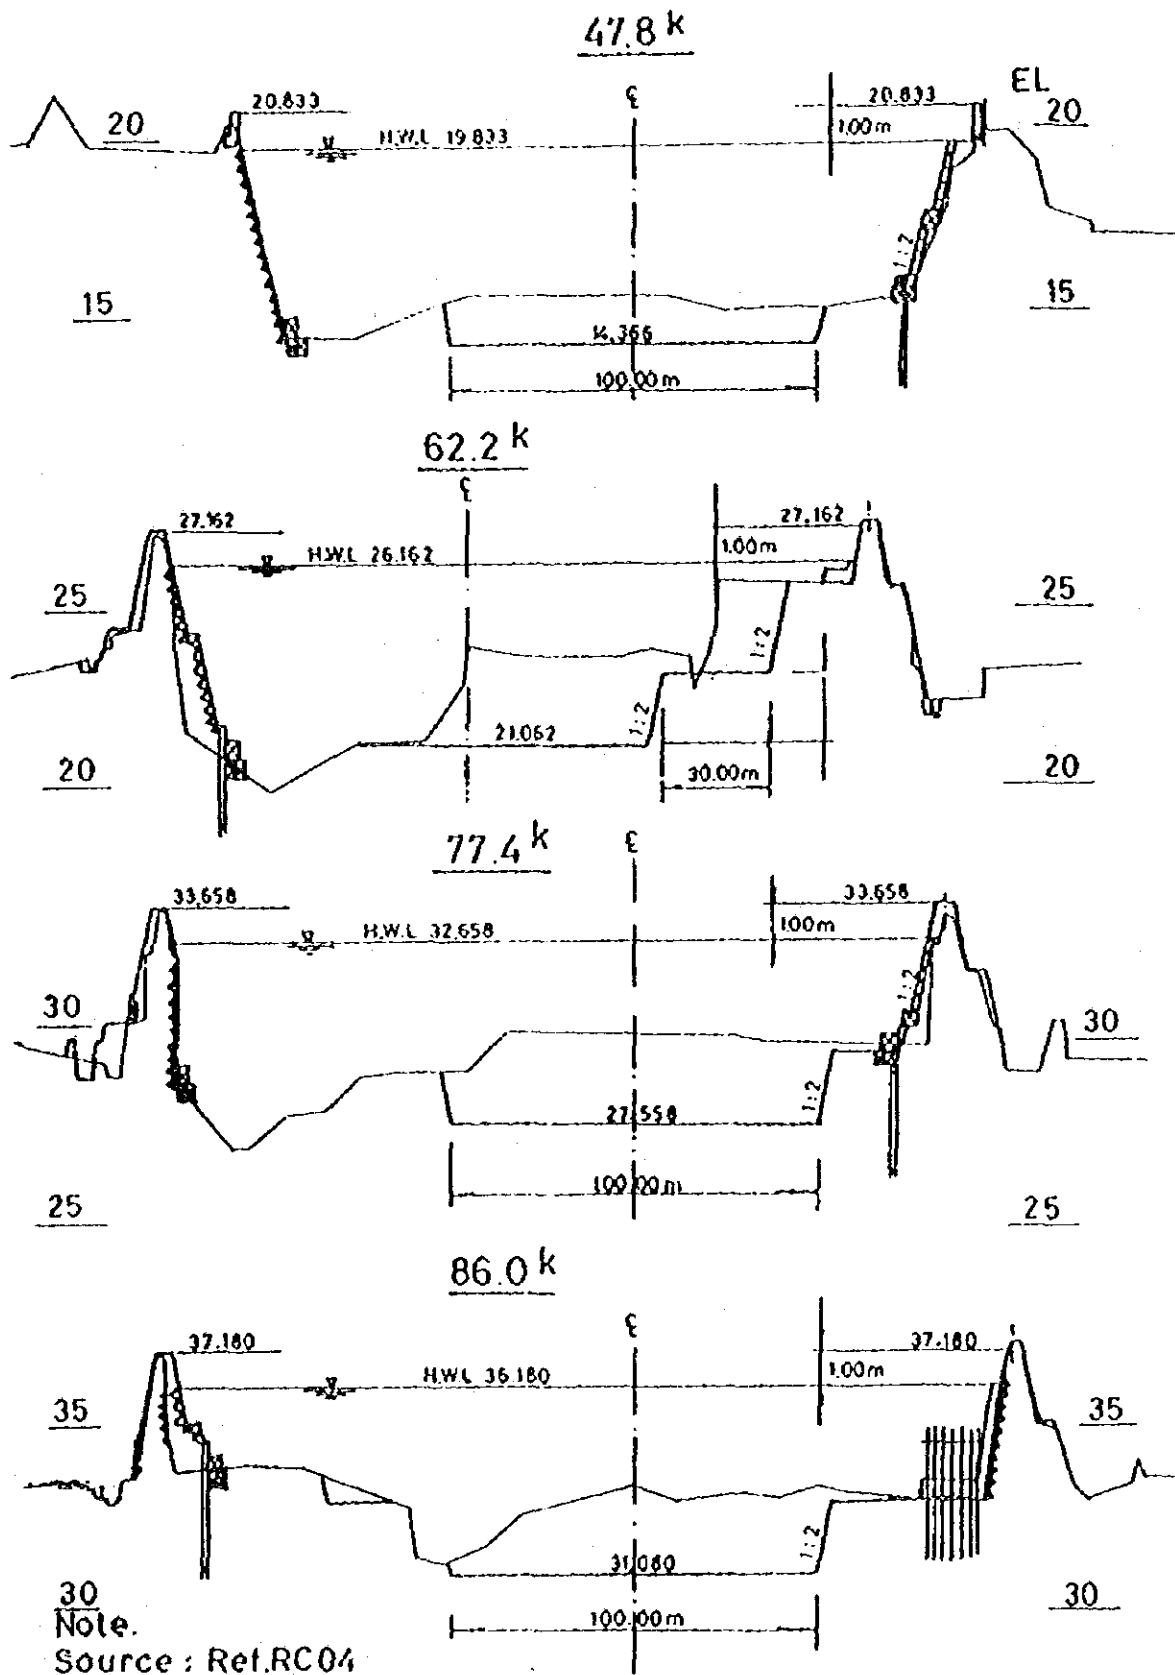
(1) TYPICAL DESIGN CROSS SECTION
